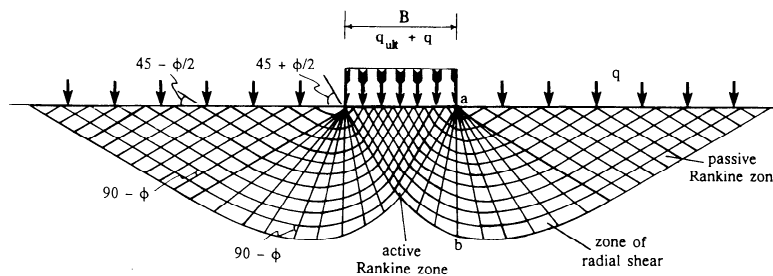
Bearing capacity of a shallow footing; no friction on footing base.
